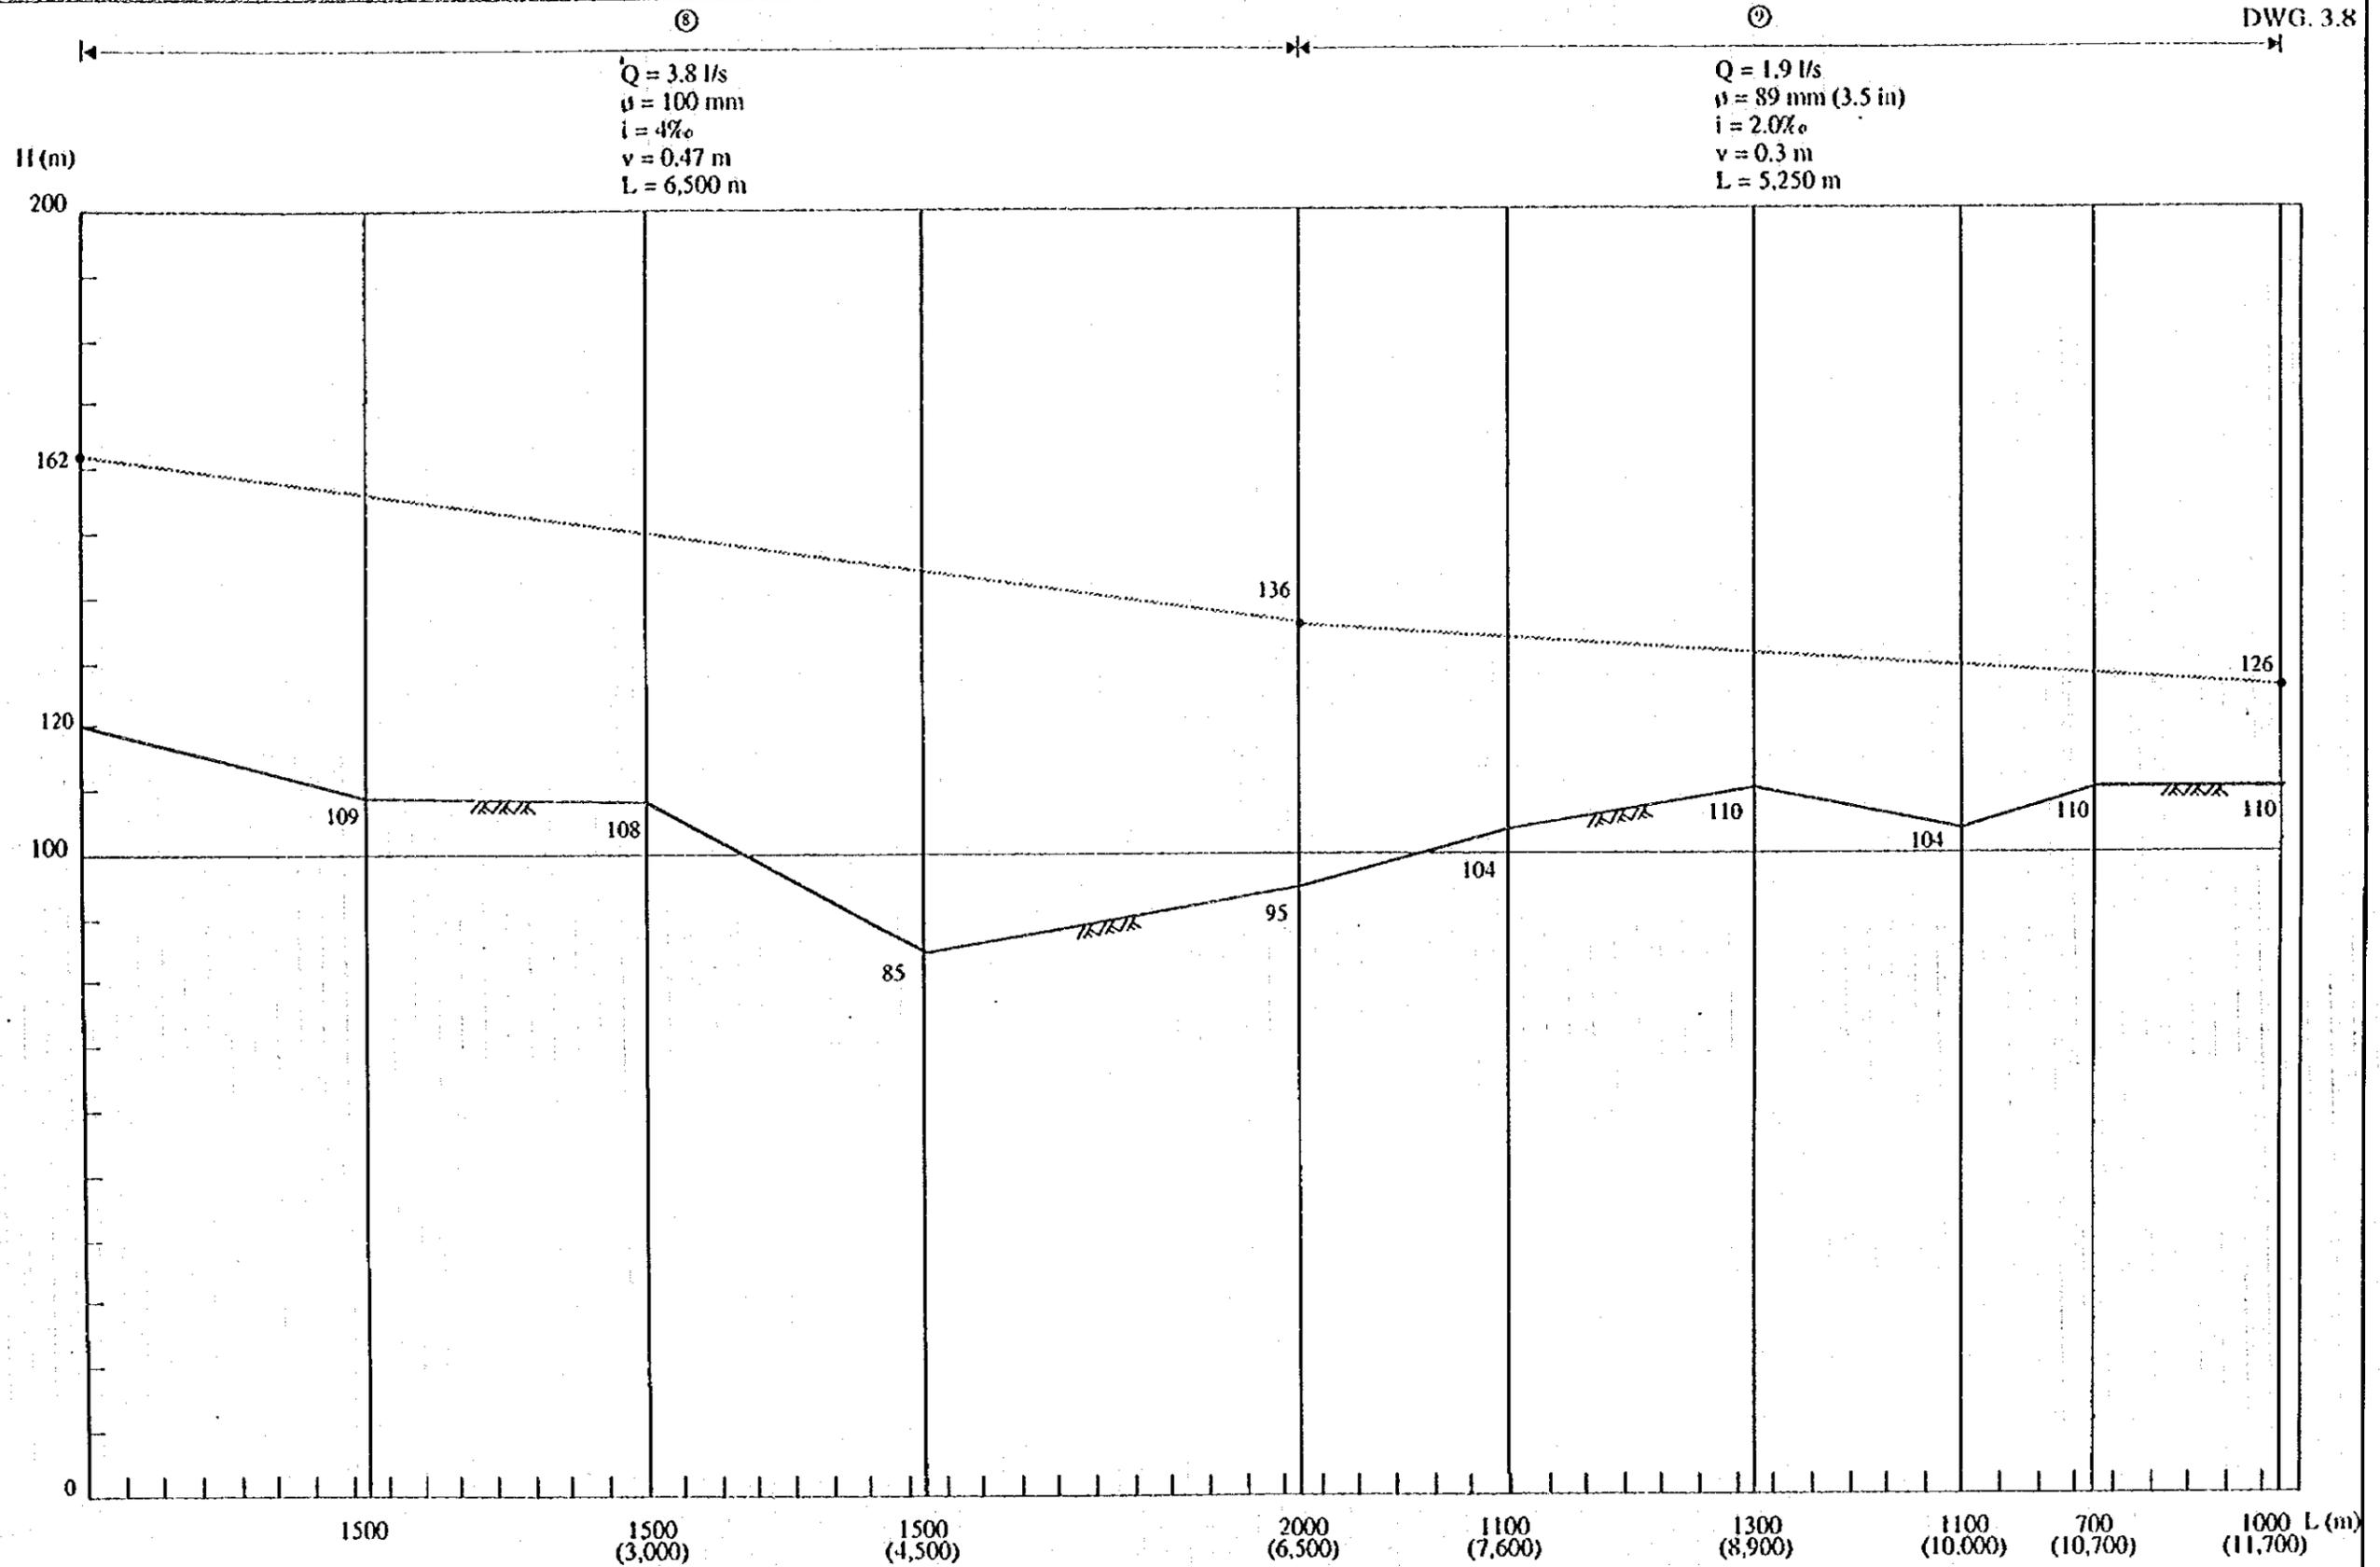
Hydraulic Profile (Ain Defali) (1/6)
